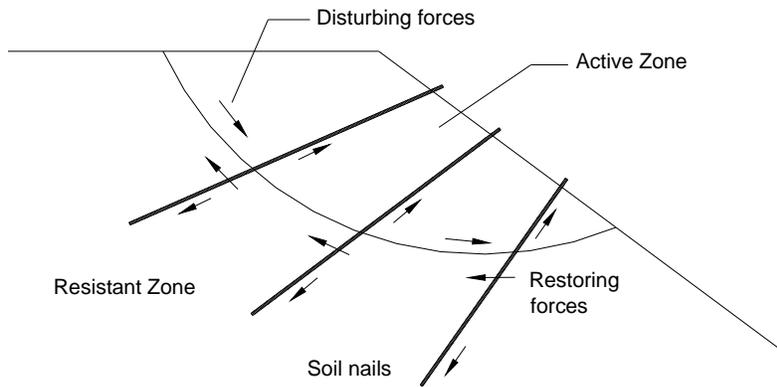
Soil nailing load transfer for slope stabilization (Steward 1994)
